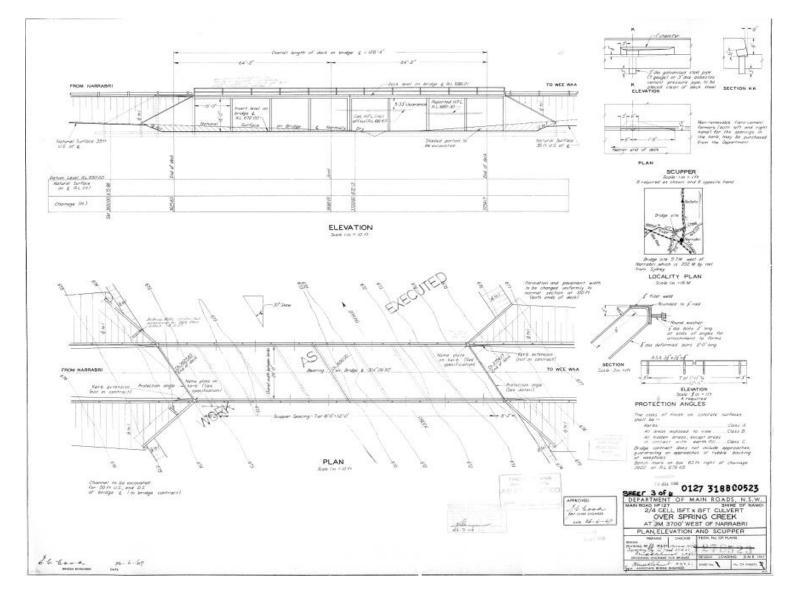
Extract from the existing bridge sized culvert (B3858) design drawings (Transport)
